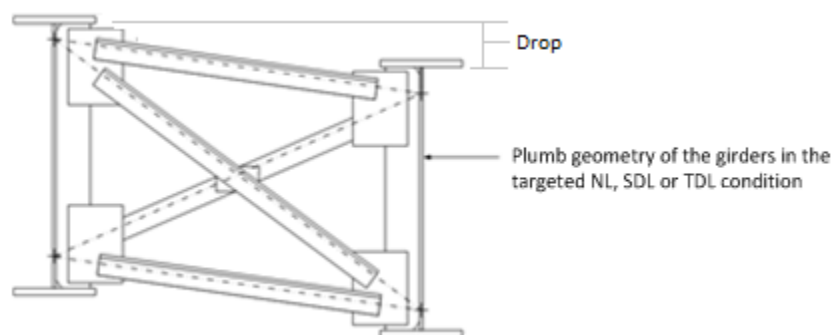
Drop Between Girders at an Intermediate Cross-Frame Framed Normal to the Girder Tangents
